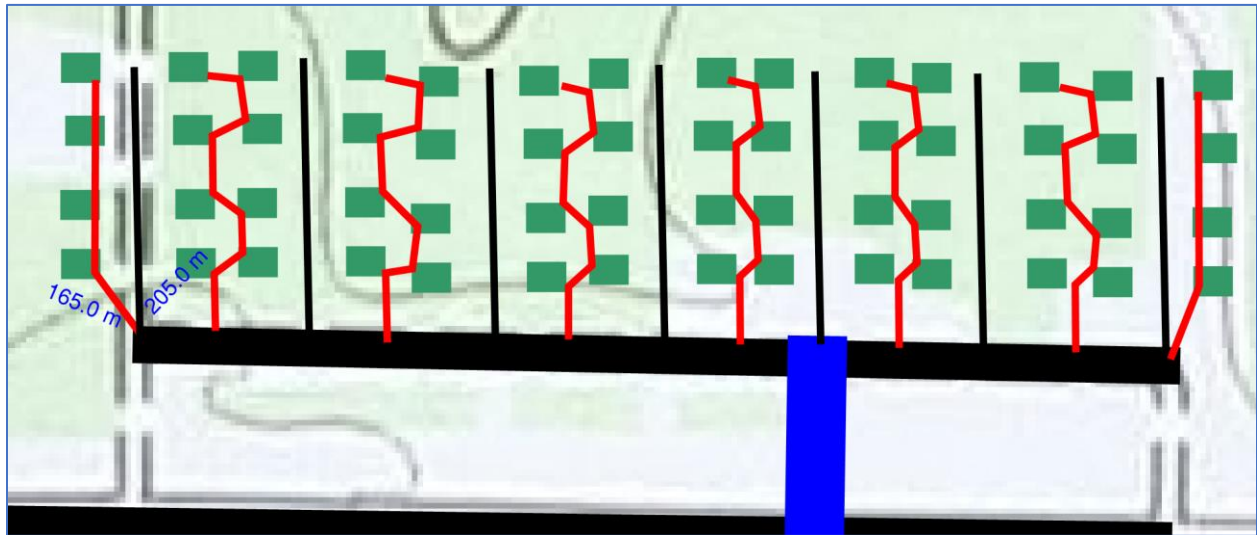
Simplified Sewer Connection Between Houses and Streets. (Backyard and Front Yard Models)
